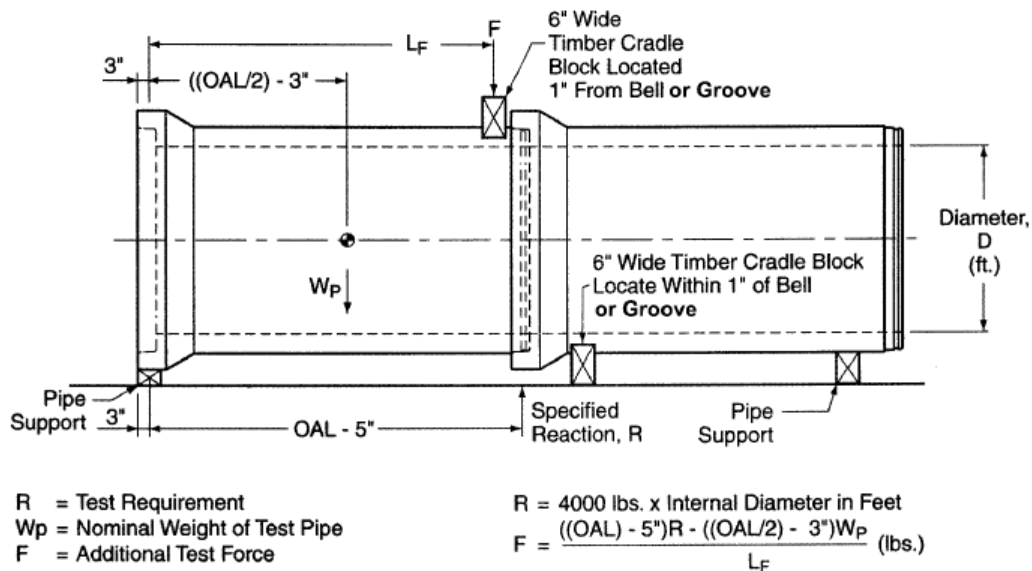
Joint shear test schematic (ASTM C497-16a, 2016)
